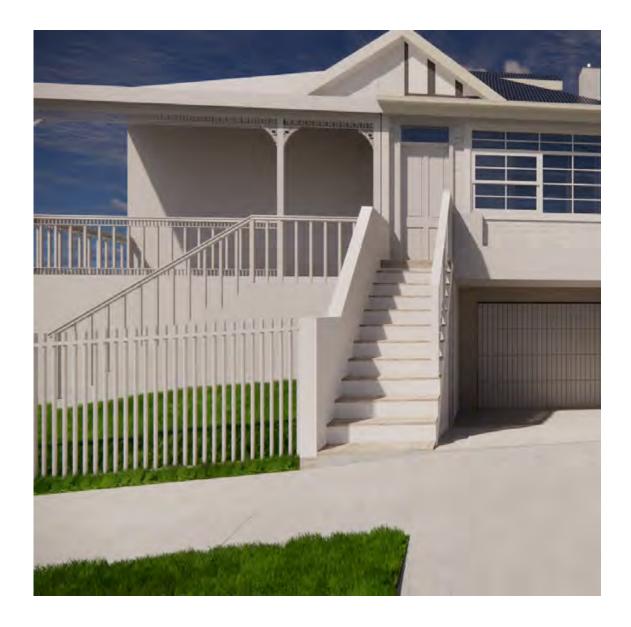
& 2 - Montages lodged with current DA2024/0032 Alterations and additions to a semidetached dwelling was lodged for 24 Thornton Street, Fairlight prepared by Actions Plans
